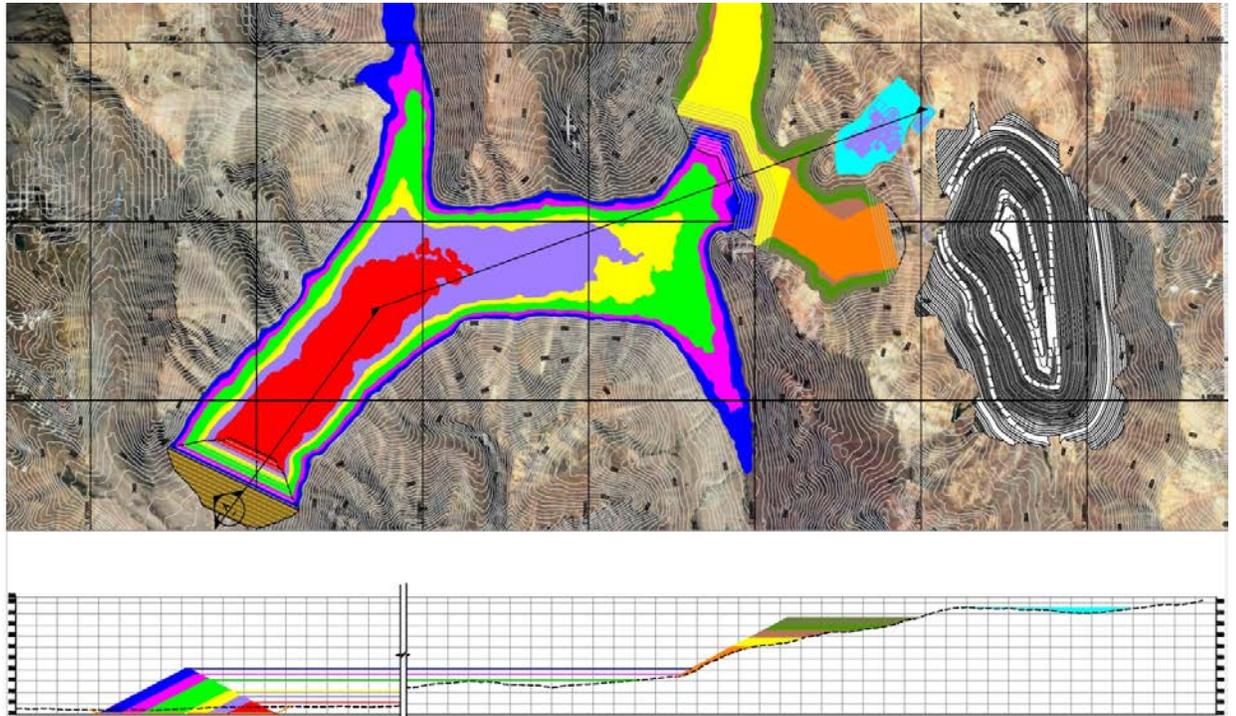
Tailings Storage Facility and Waste Rock Storage Facility Location Plan and Section
